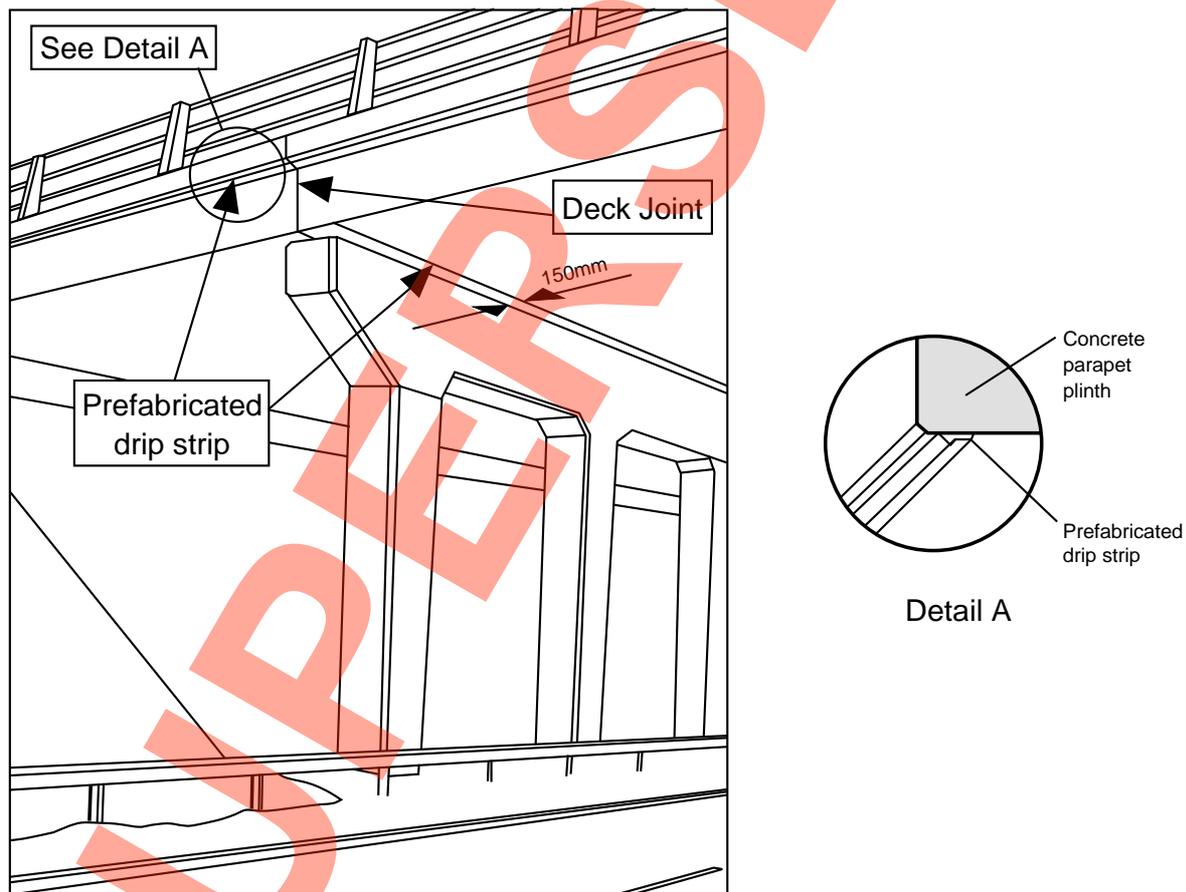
EXAMPLE OF PREFABRICATED DRIP STRIPS ON BRIDGE DECK SOFFITS
